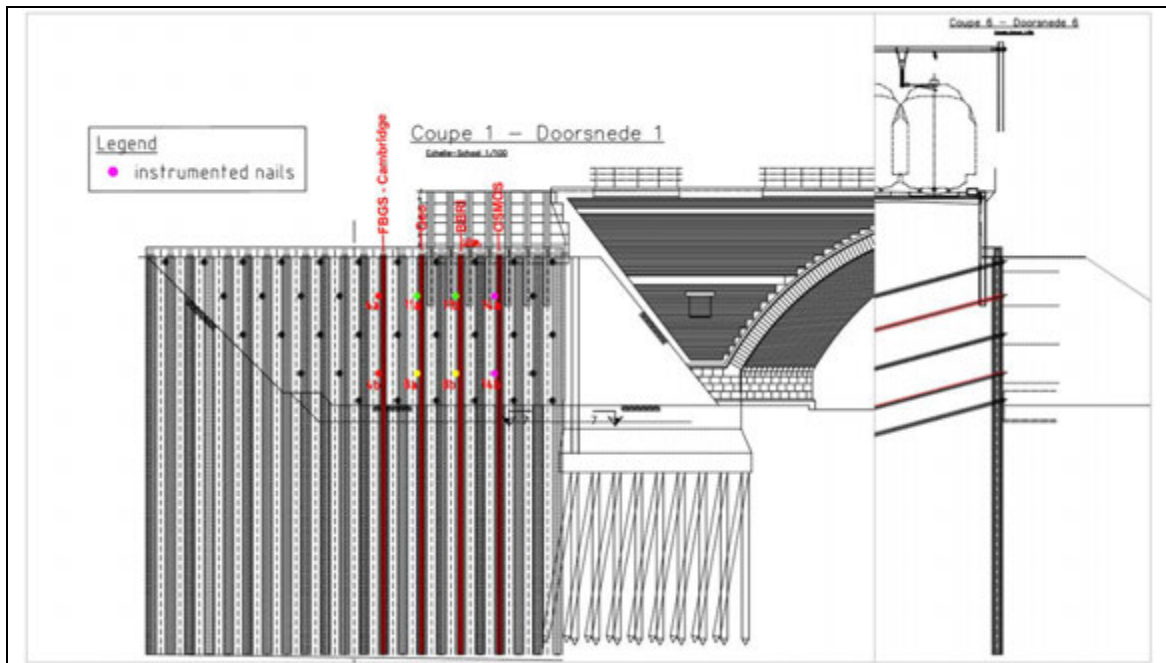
Plan of nailed HEB jet grout wall (front view and side view).
